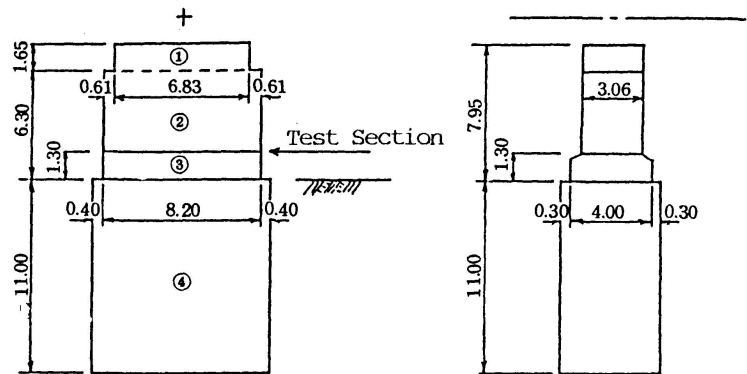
Fuji River Bridge on the Tokaido Line (out-of-use brick pier, 8P; unit:m) Superstructure:Theodore truss W=1433KN
